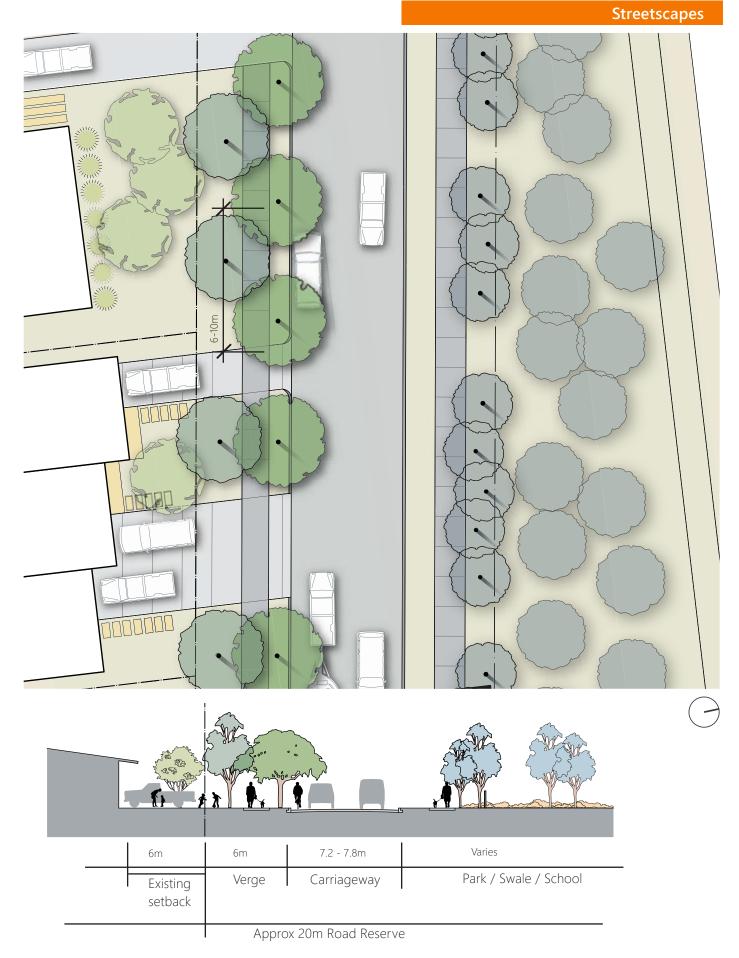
Residential / Park Typology Plan and Section and typical dimensions, Scale 1 : 250 @ A4
